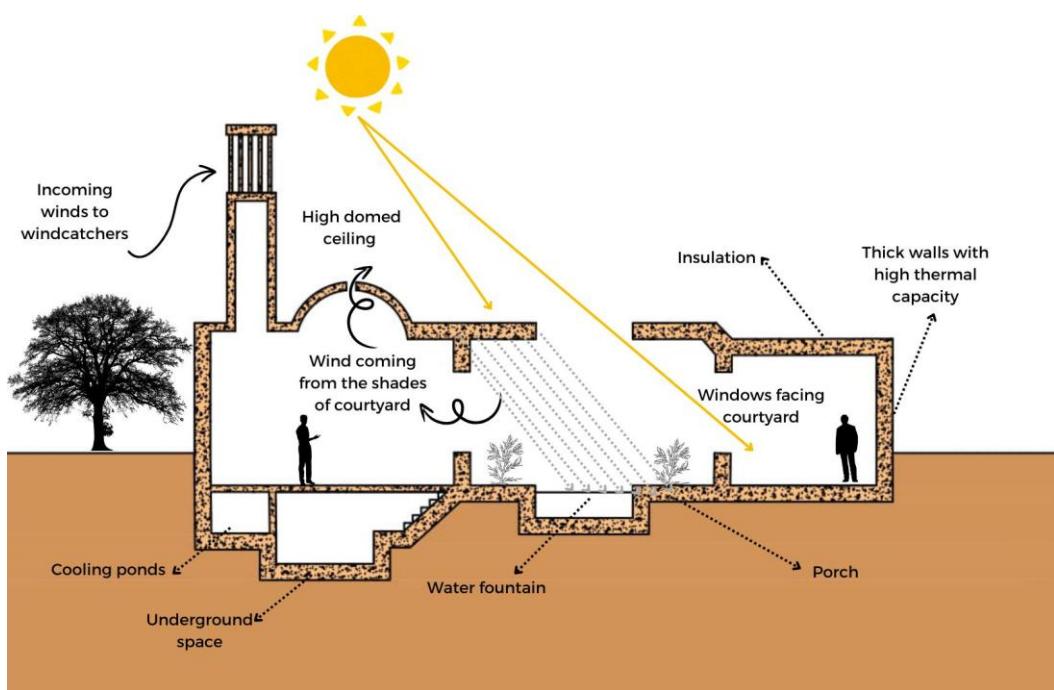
Traditional house form in Yazd. (Source: Authors, 2024)
